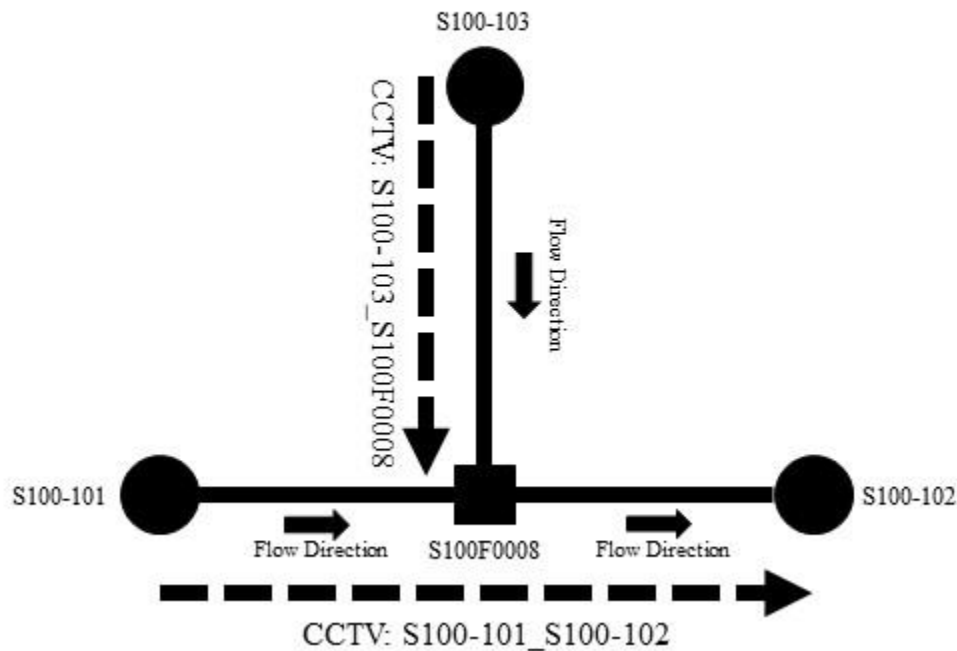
Performing Sewer Pipe Inspections
